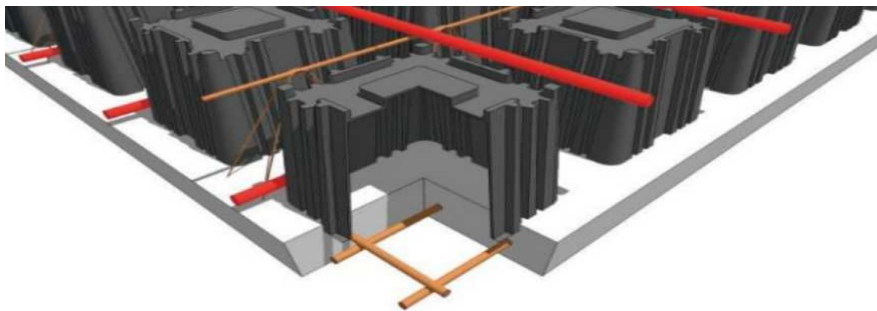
According to The airdeck technology, the concrete mixture is first placed in the formwork
